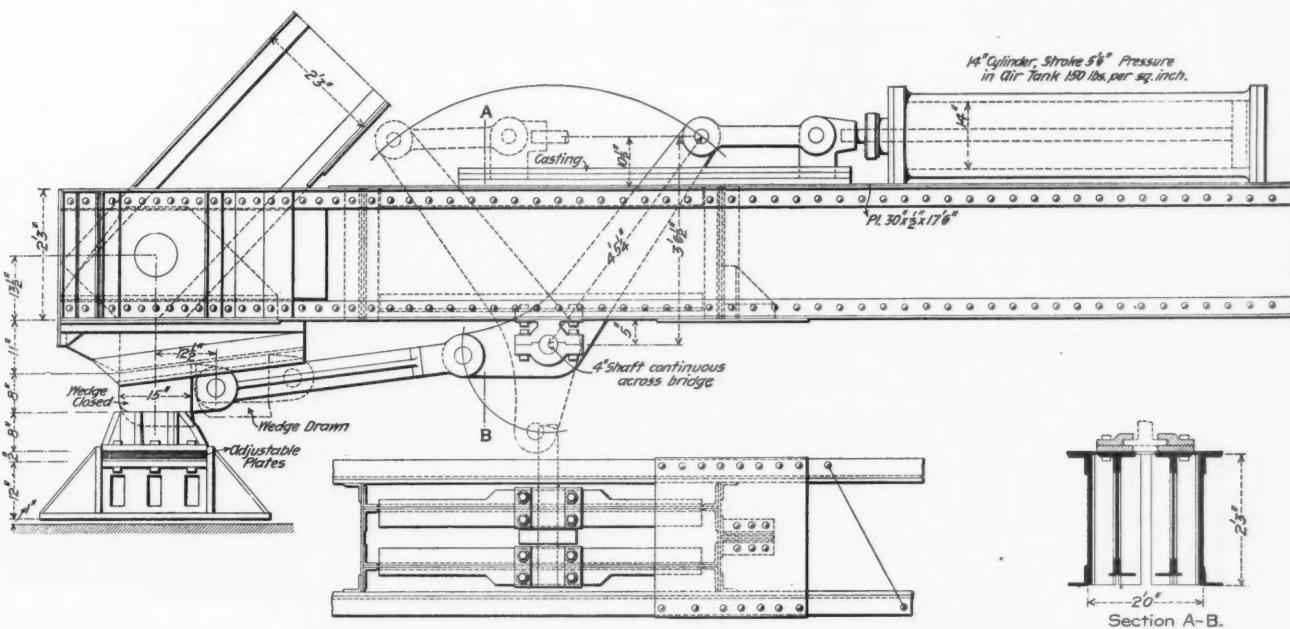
Details of End Lift of Draw Span—Tennessee River Bridge.
